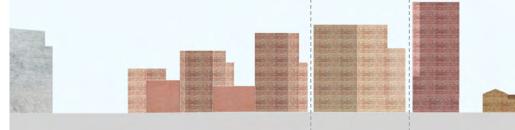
Proposed illustrative massing highlighting Civic Architectural Approach buildings
